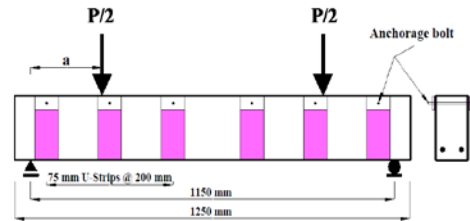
Shear Strengthening with End Anchoring B3 and B4<sup>(21)</sup>
